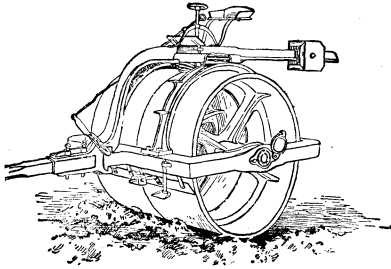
The Austin reversible horse roller, provided with roller bearings to lighten draft, and weight plates for increasing weight.
